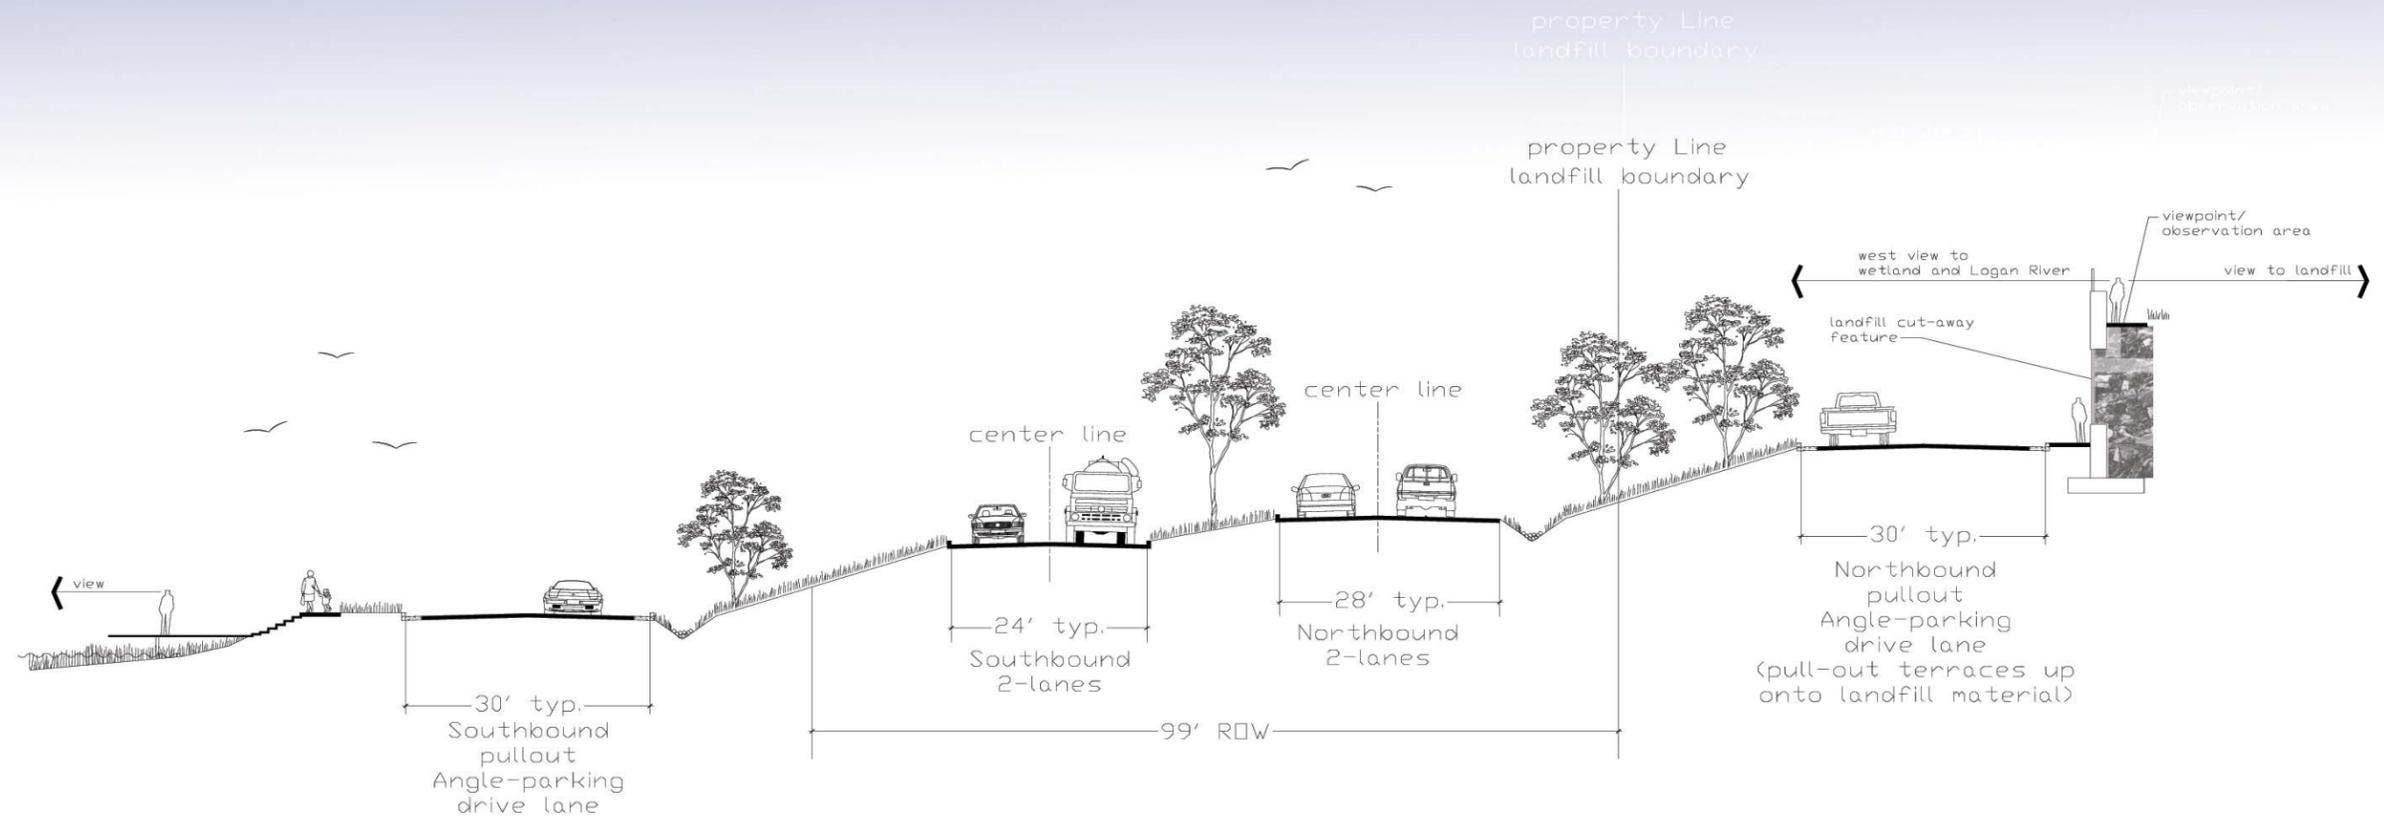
Cross-section of 1900 West (looking north), including pullout areas, landfill cut-away, and Avocet Park overlook. Not to scale.
